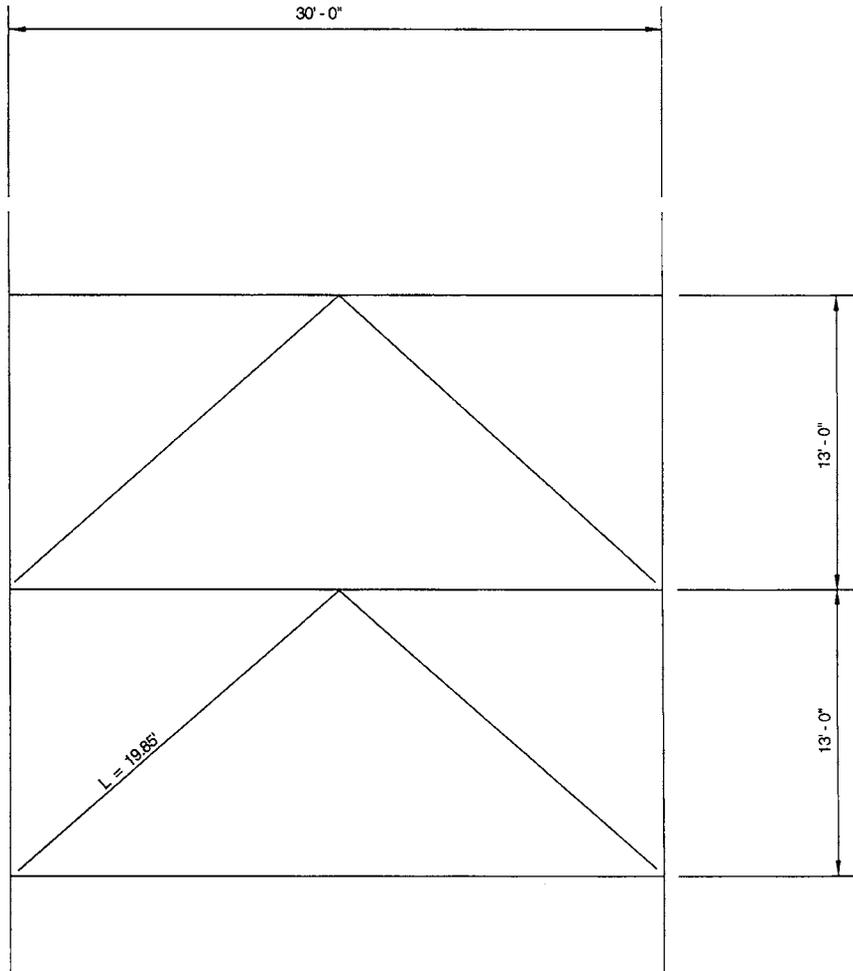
Inverted V-braces in a lateral bracing bent.
